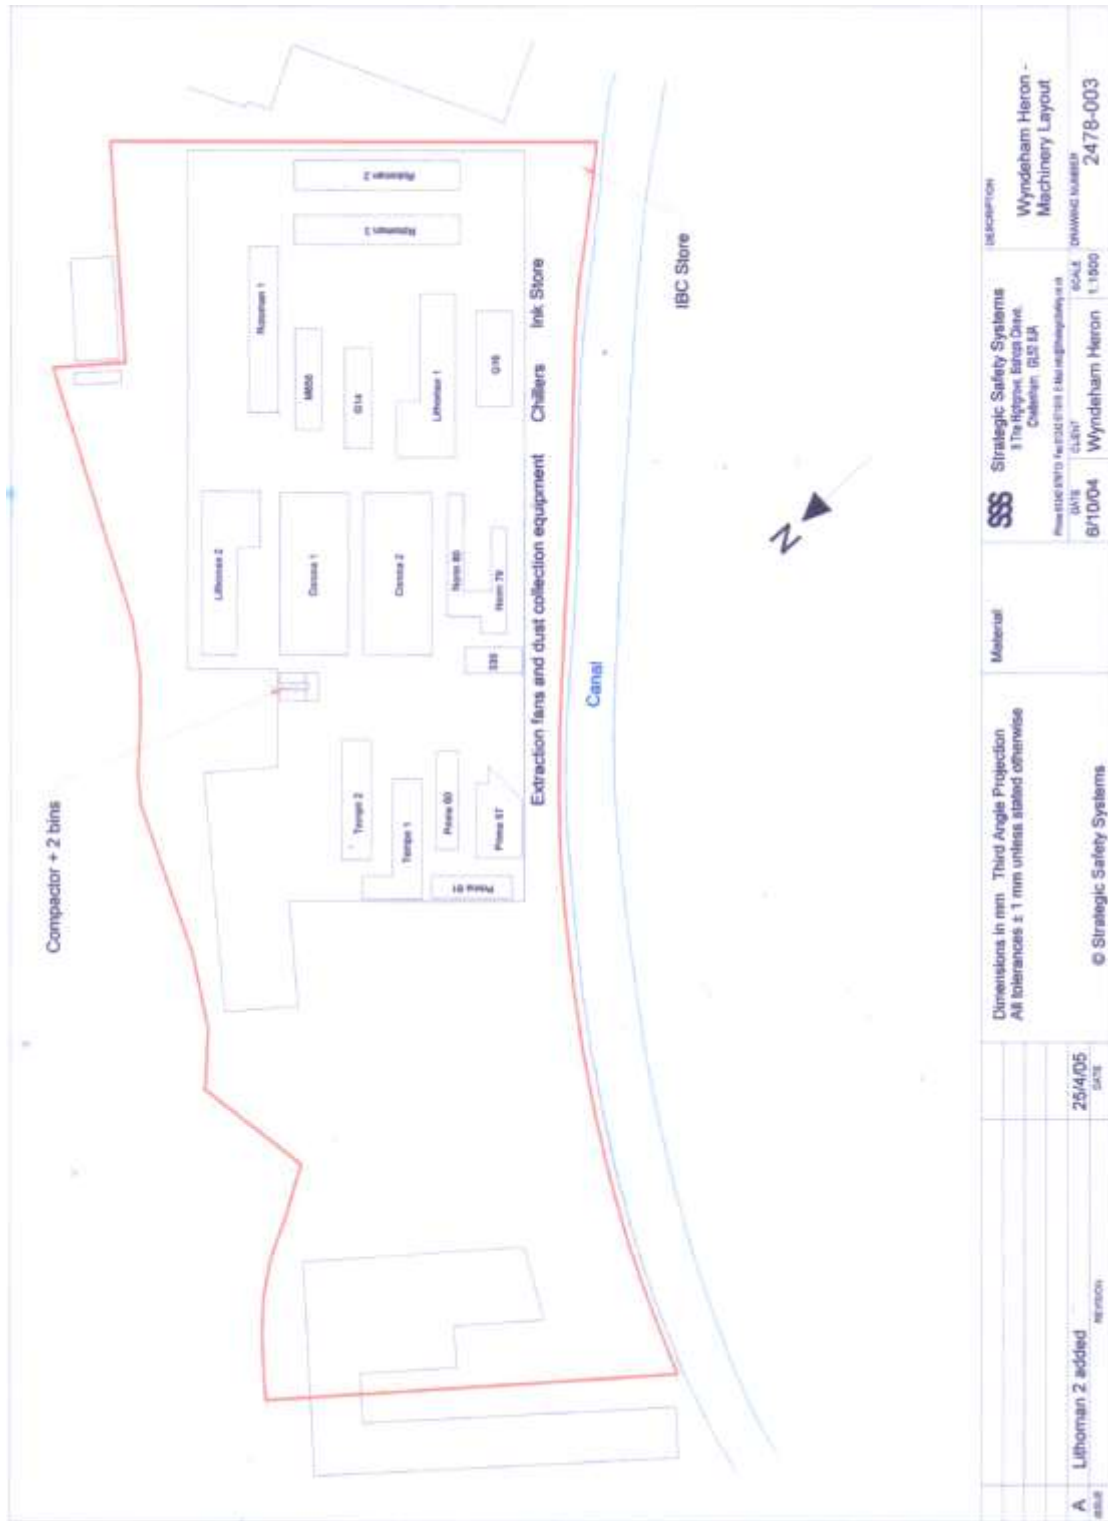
Wyndeham Heron Machinery Layout – drawing number 2478-003
